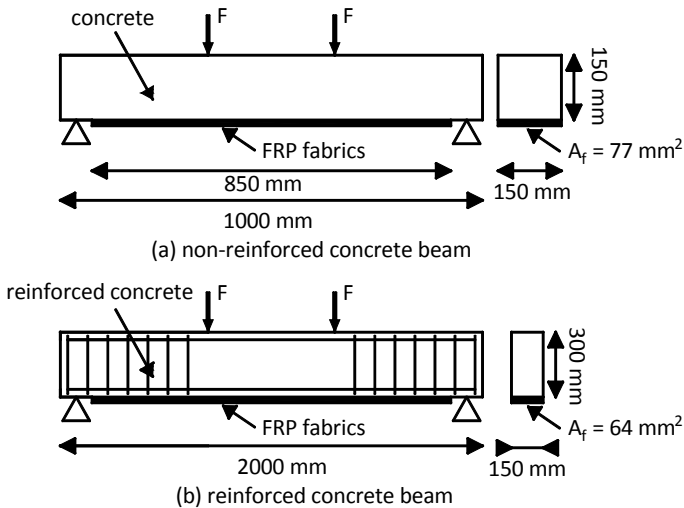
Test setup of non-reinforced (a) and reinforced (b) concrete specimens (Baumert, Green, and Erki 1996)
